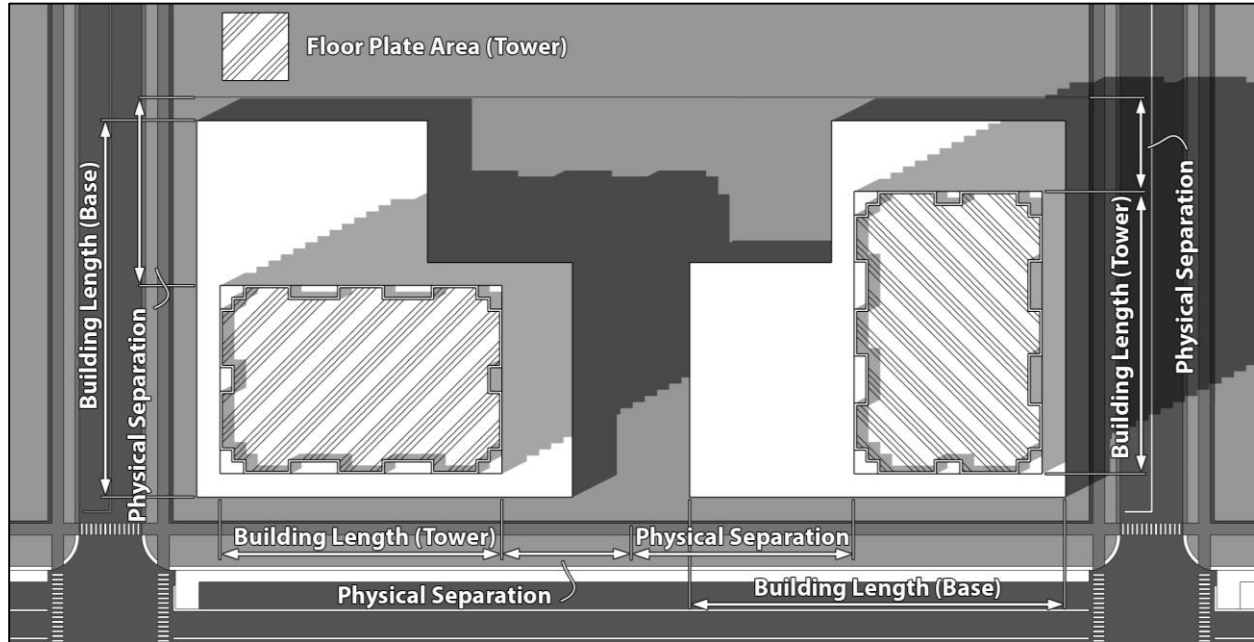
A diagram that demonstrates in plan how built form regulations are used to shape building design.
